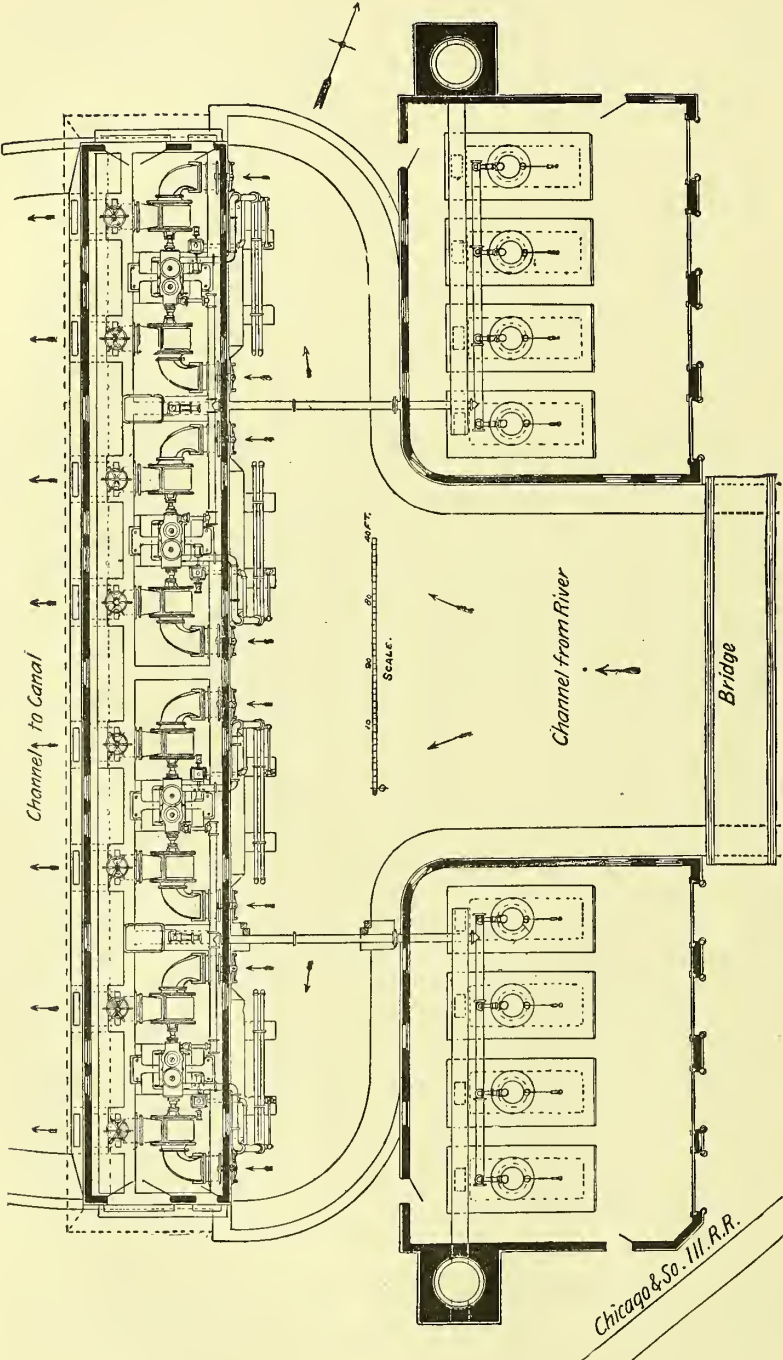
PLAN OF BRIDGEPORT PUMPING STATION.
